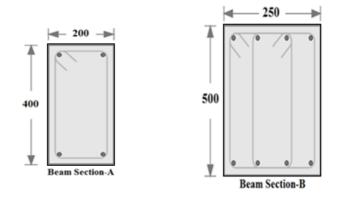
33: Final Beam Design Sections (ETABS 2016)
